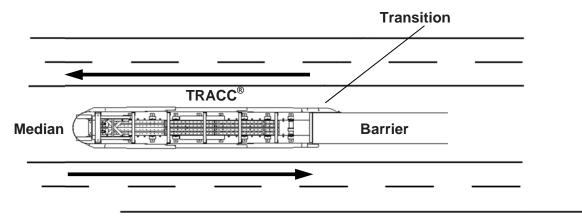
Bidirectional Traffic Flow - Requires Transition on One Side.
